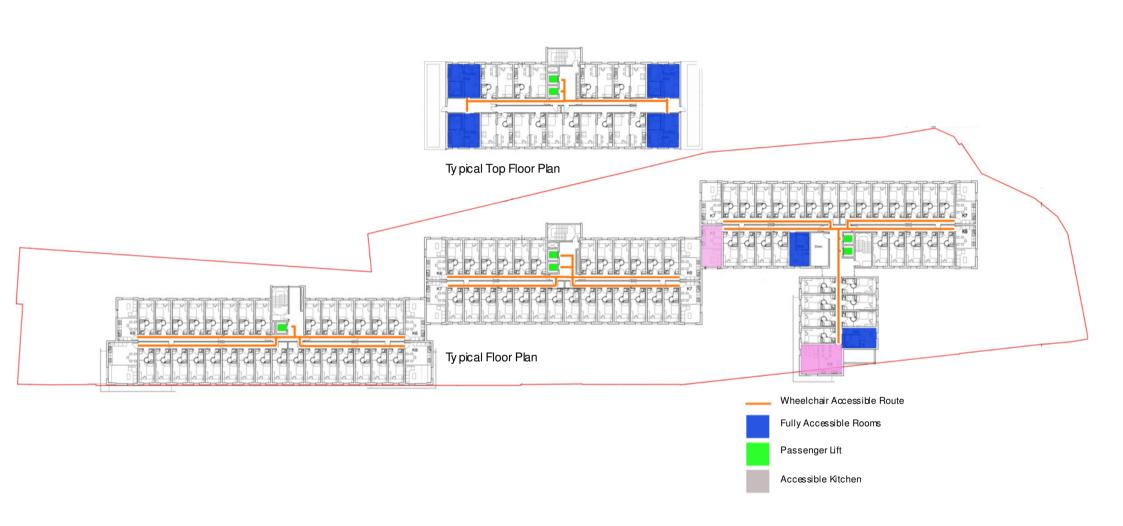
2 - Acc ess Diagrams - Typic al Floor Plans
